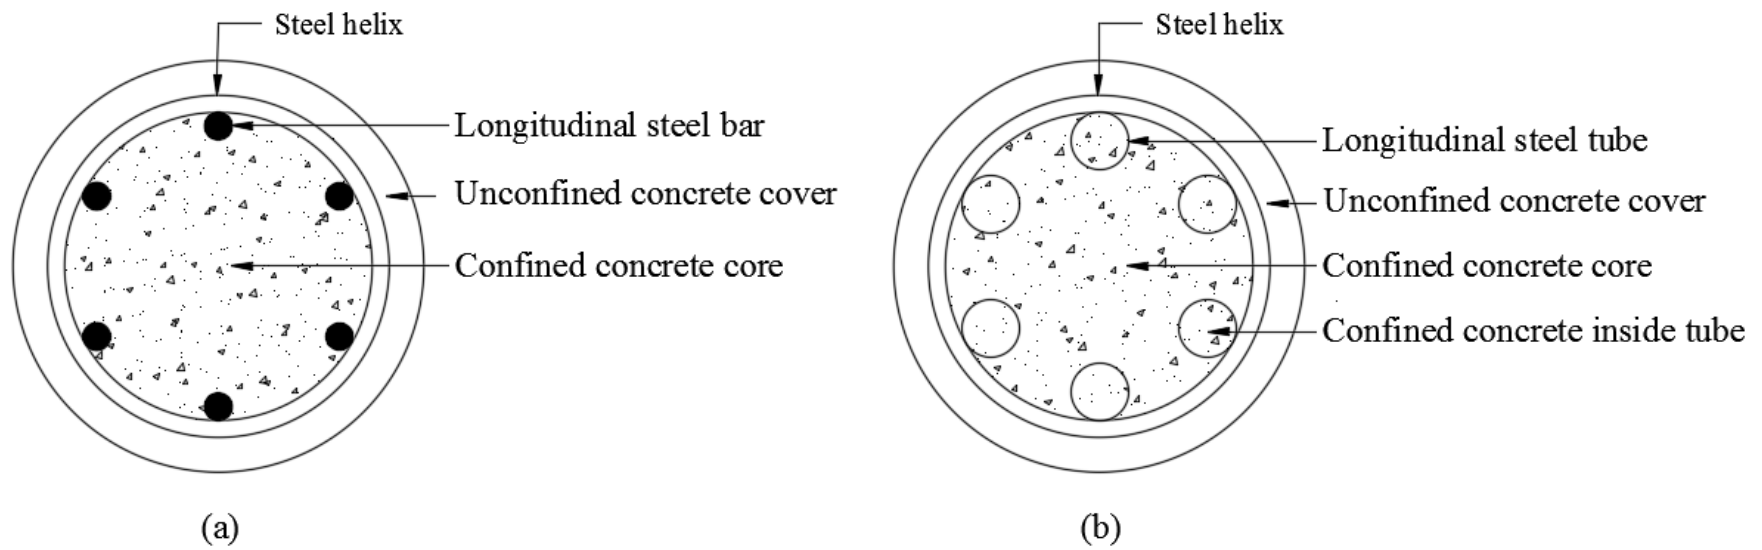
Cross-sections of the SCC columns: (a) column reinforced with steel bars; and (b) column reinforced with steel tubes
